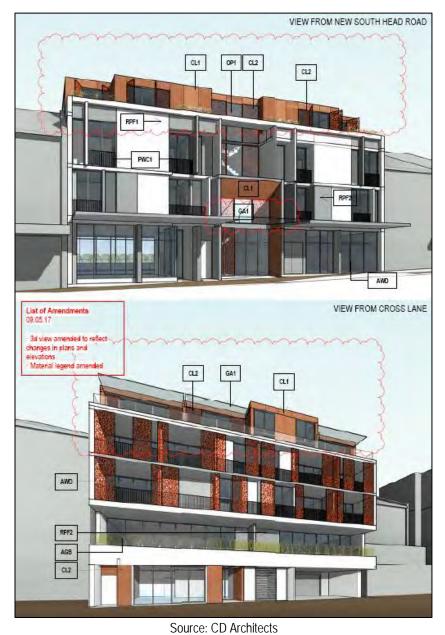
Approved Development at Nos. 434-440 New South Head Road (as viewed from New South Head Road and Cross Lane)
